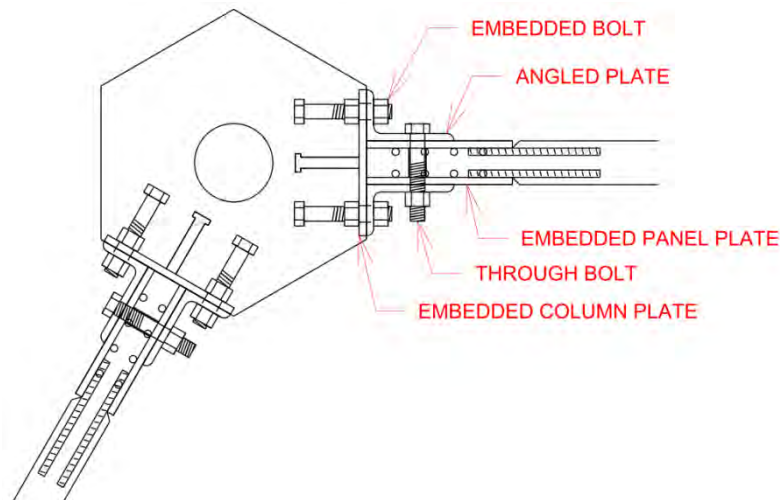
Bolted Connection Detail Used for HCUP Tower
